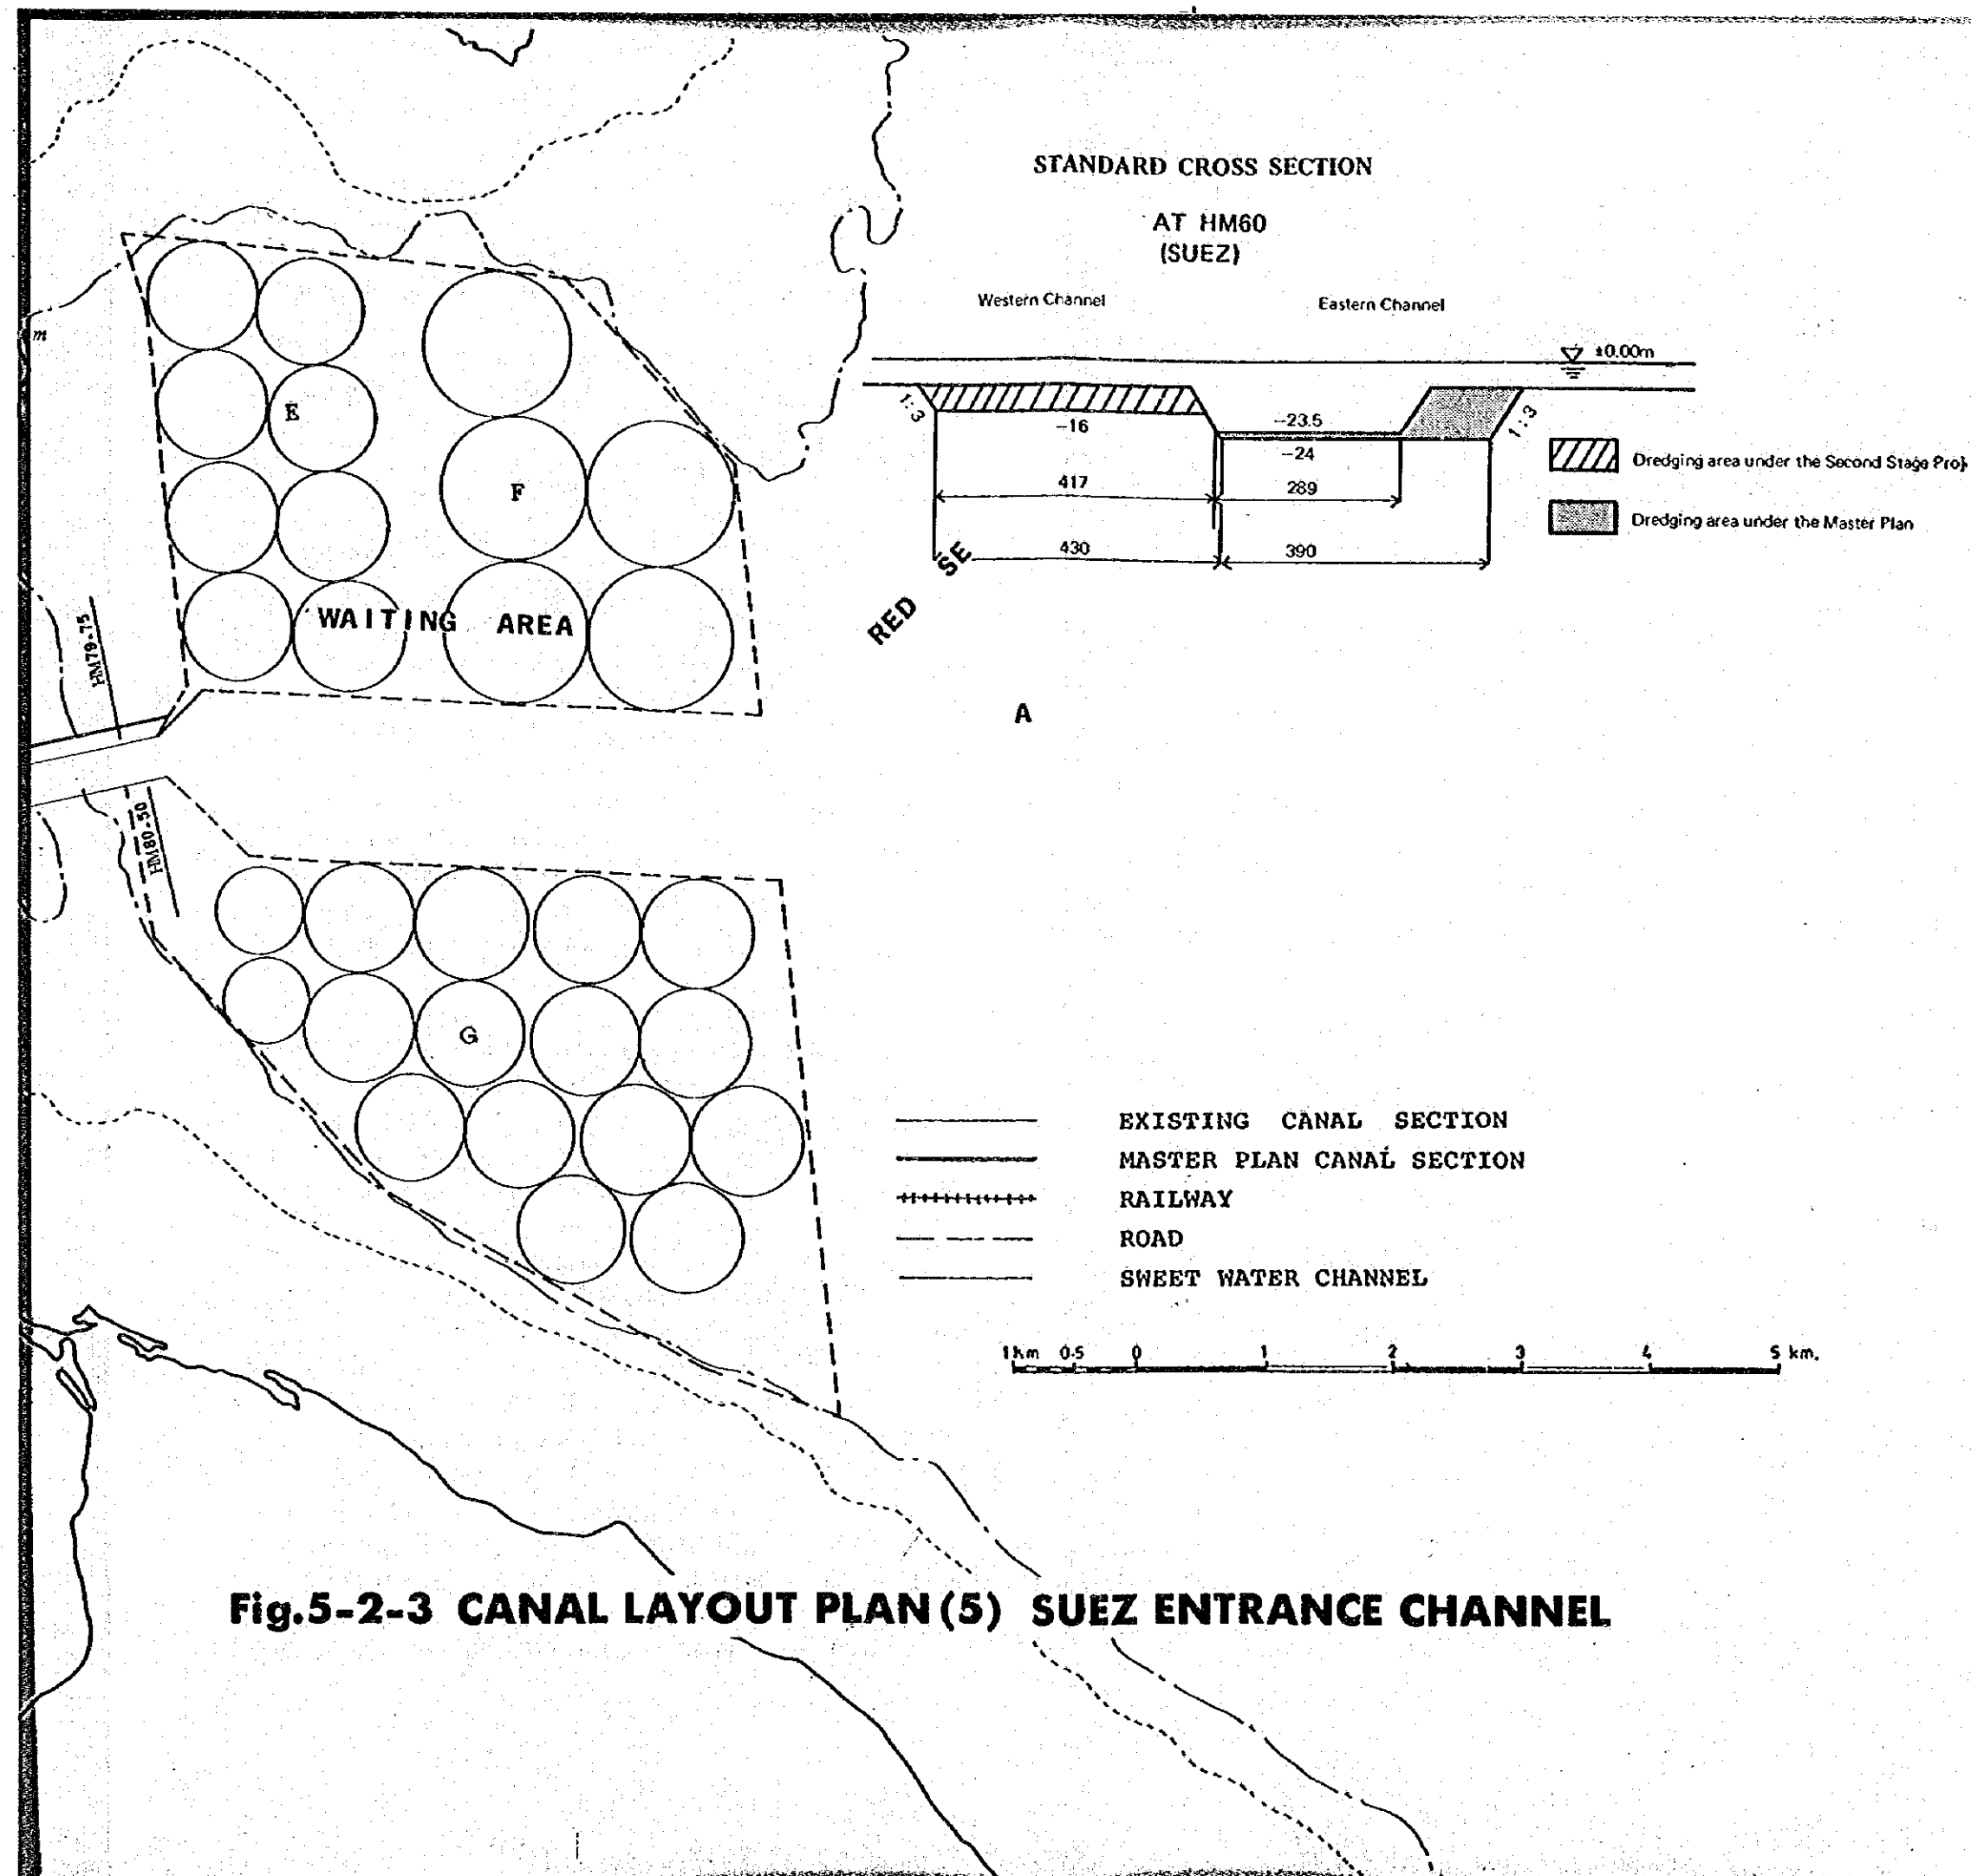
CANAL LAYOUT PLAN (5) SUEZ ENTRANCE CHANNEL
